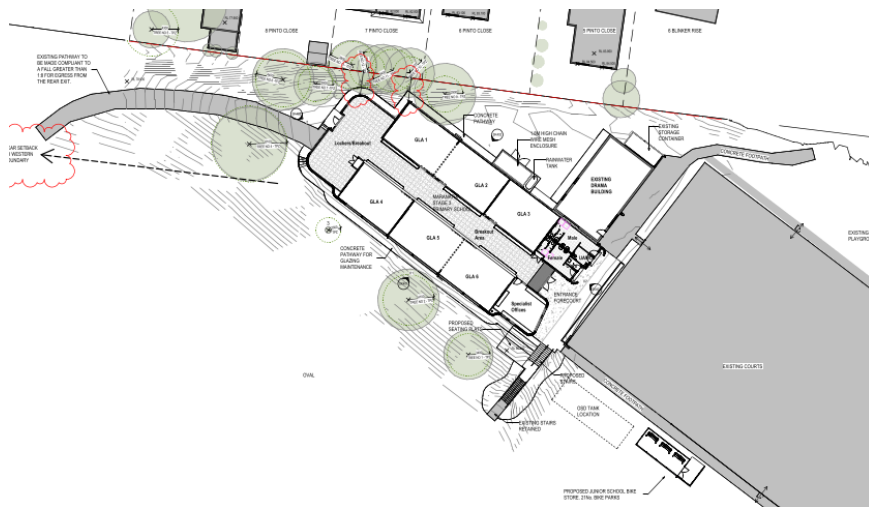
Ground level of the proposed building and associated works (source: applicants' submission)
